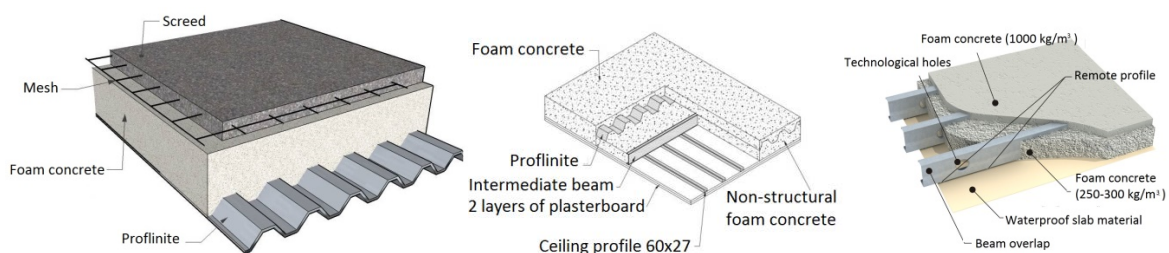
Options for slab designs with joint use of LSTWS and foam concrete [3, 4]
